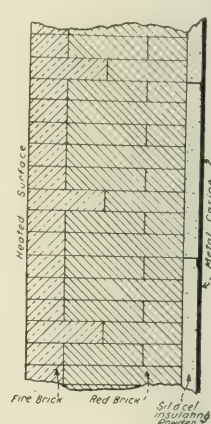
FIG. II—TYPICAL WALL CONSTRUCTION, SHOWING POWDER IN HOLLOW WALL
